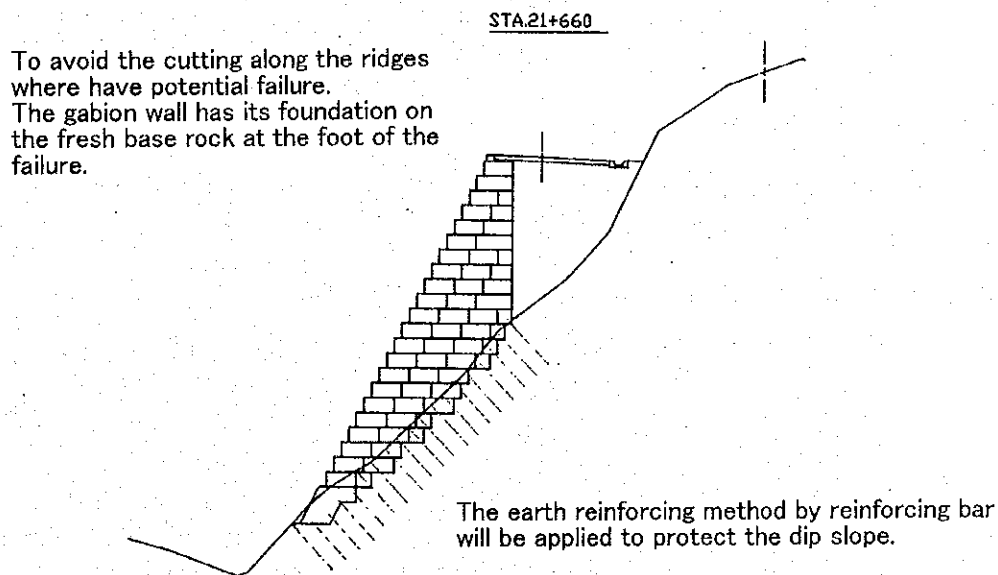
Typical Cross Section in the Sindhuli Gadhi Slope Failure Area
